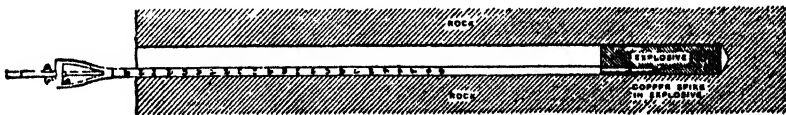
CHARGING TOOL WITH EXPLOSIVE IN SHOT-HOLE READY FOR RAMMING.
